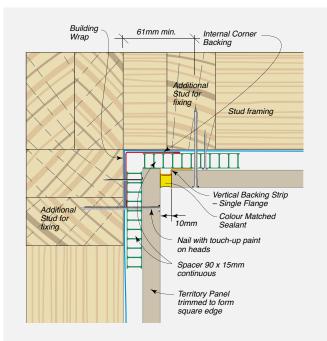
External Corner Detail - With Coloured External Corner Trim - Plan View
